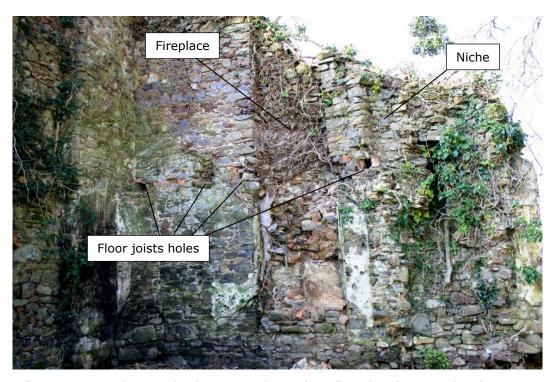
Fireplace and adjacent niche at first floor level on inside of western wall of southern ruin
